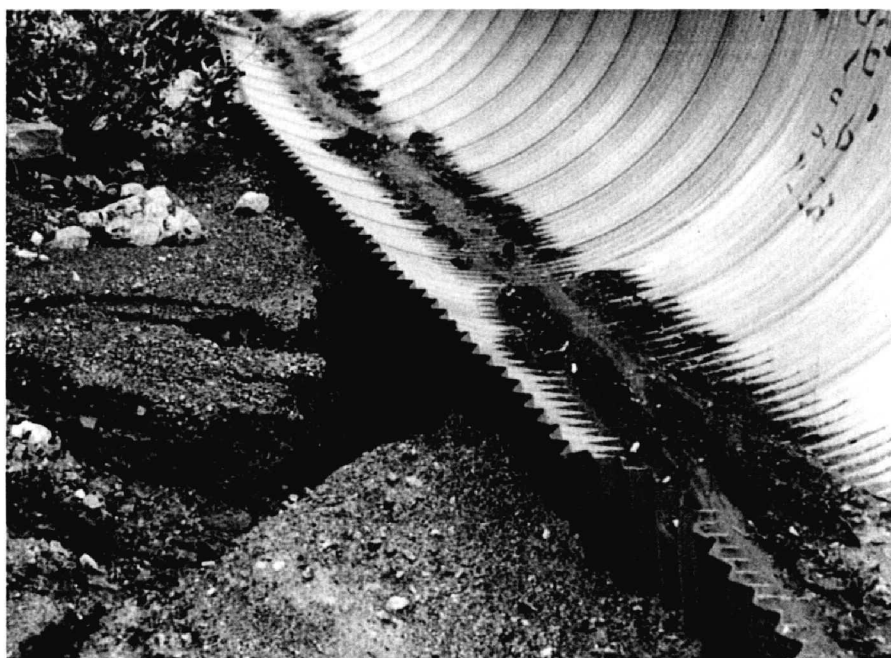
Erosion of Backfill and Undermining of Spillway Chute (7-81)
